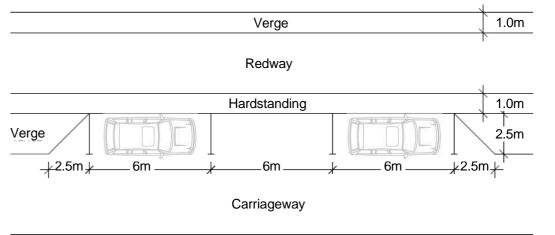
On street parking layout with end bays squared (Type 4A)
